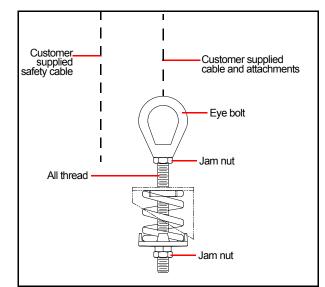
Overhead Suspension Assembly - Eye Bolt
